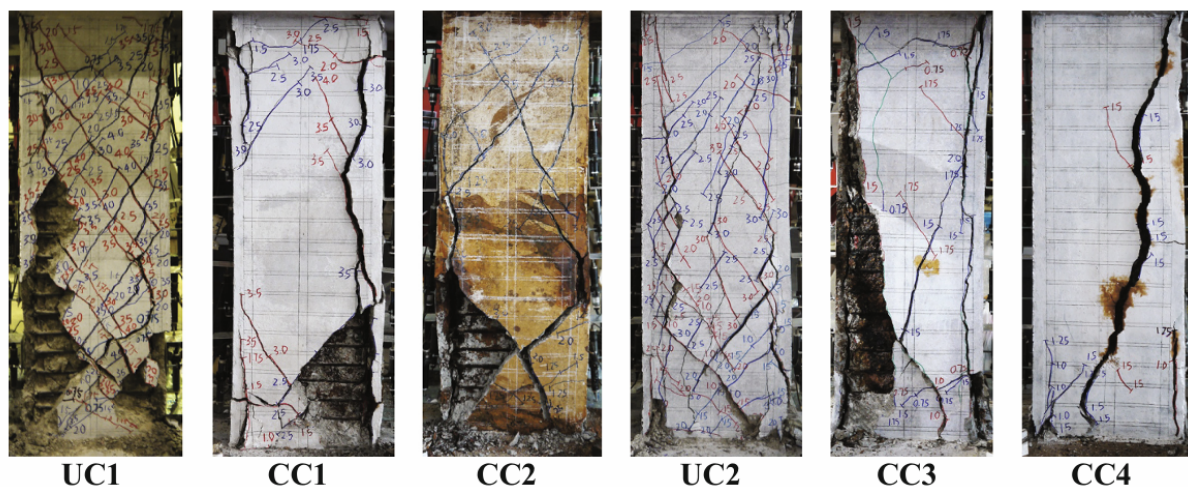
Failure crack patterns observed in the test specimens under axial loading (Vu and Lu 2018).
